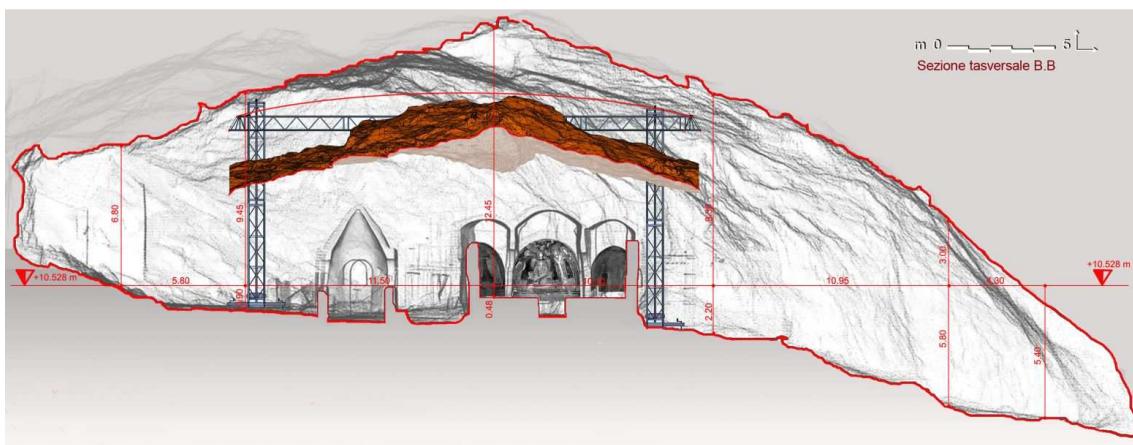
Design of a new shell to protect constructions from water dropping, which replicates the roof of the cave
